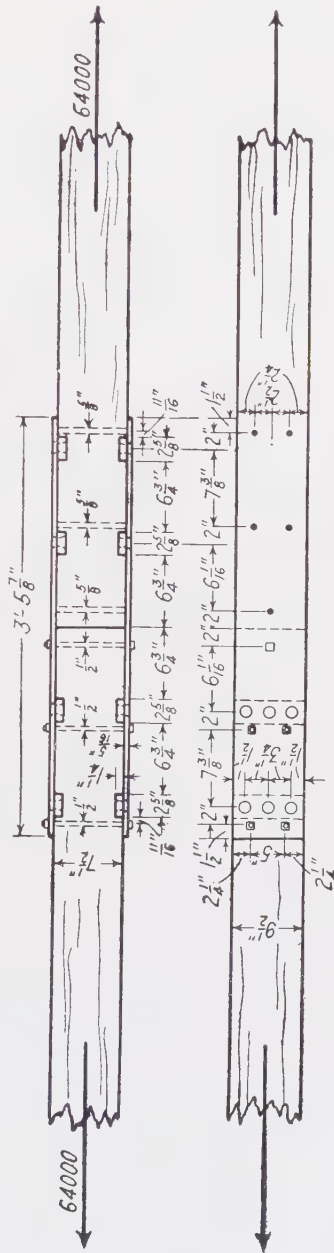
b*.—Working Drawing of Joint with Steel Tabled Fish Plates.
